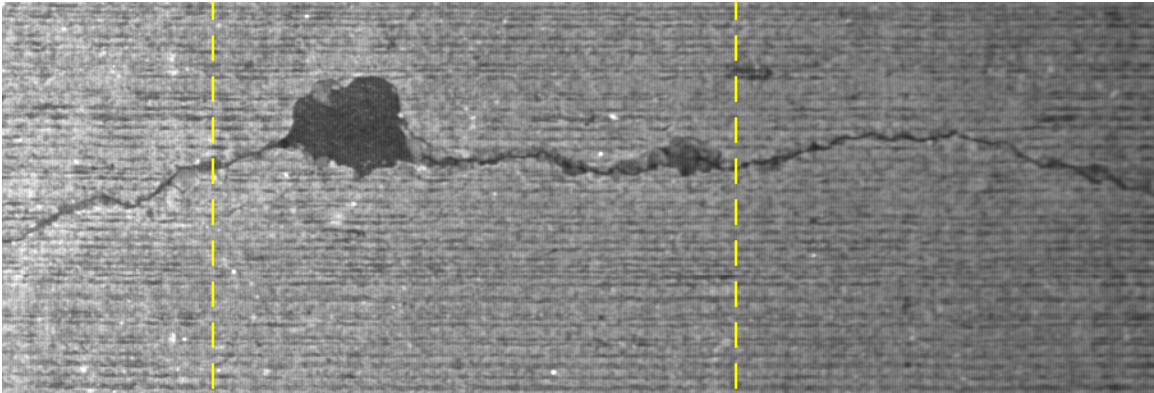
Original image of a spalled crack, in which a spalled area is filled with asphalt
